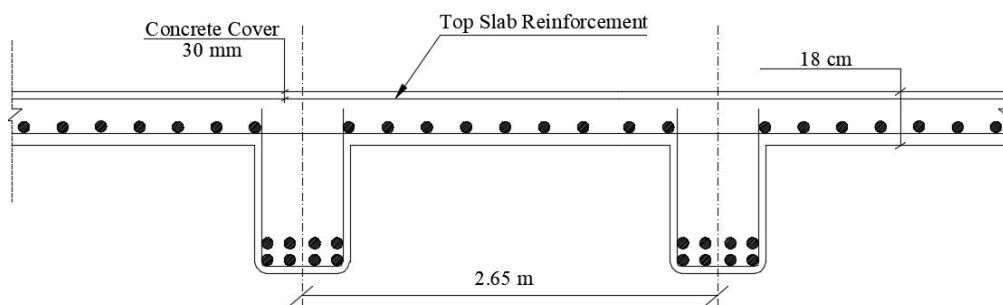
Schematic drawing for the cross-section of the reinforced concrete (RC) deck
